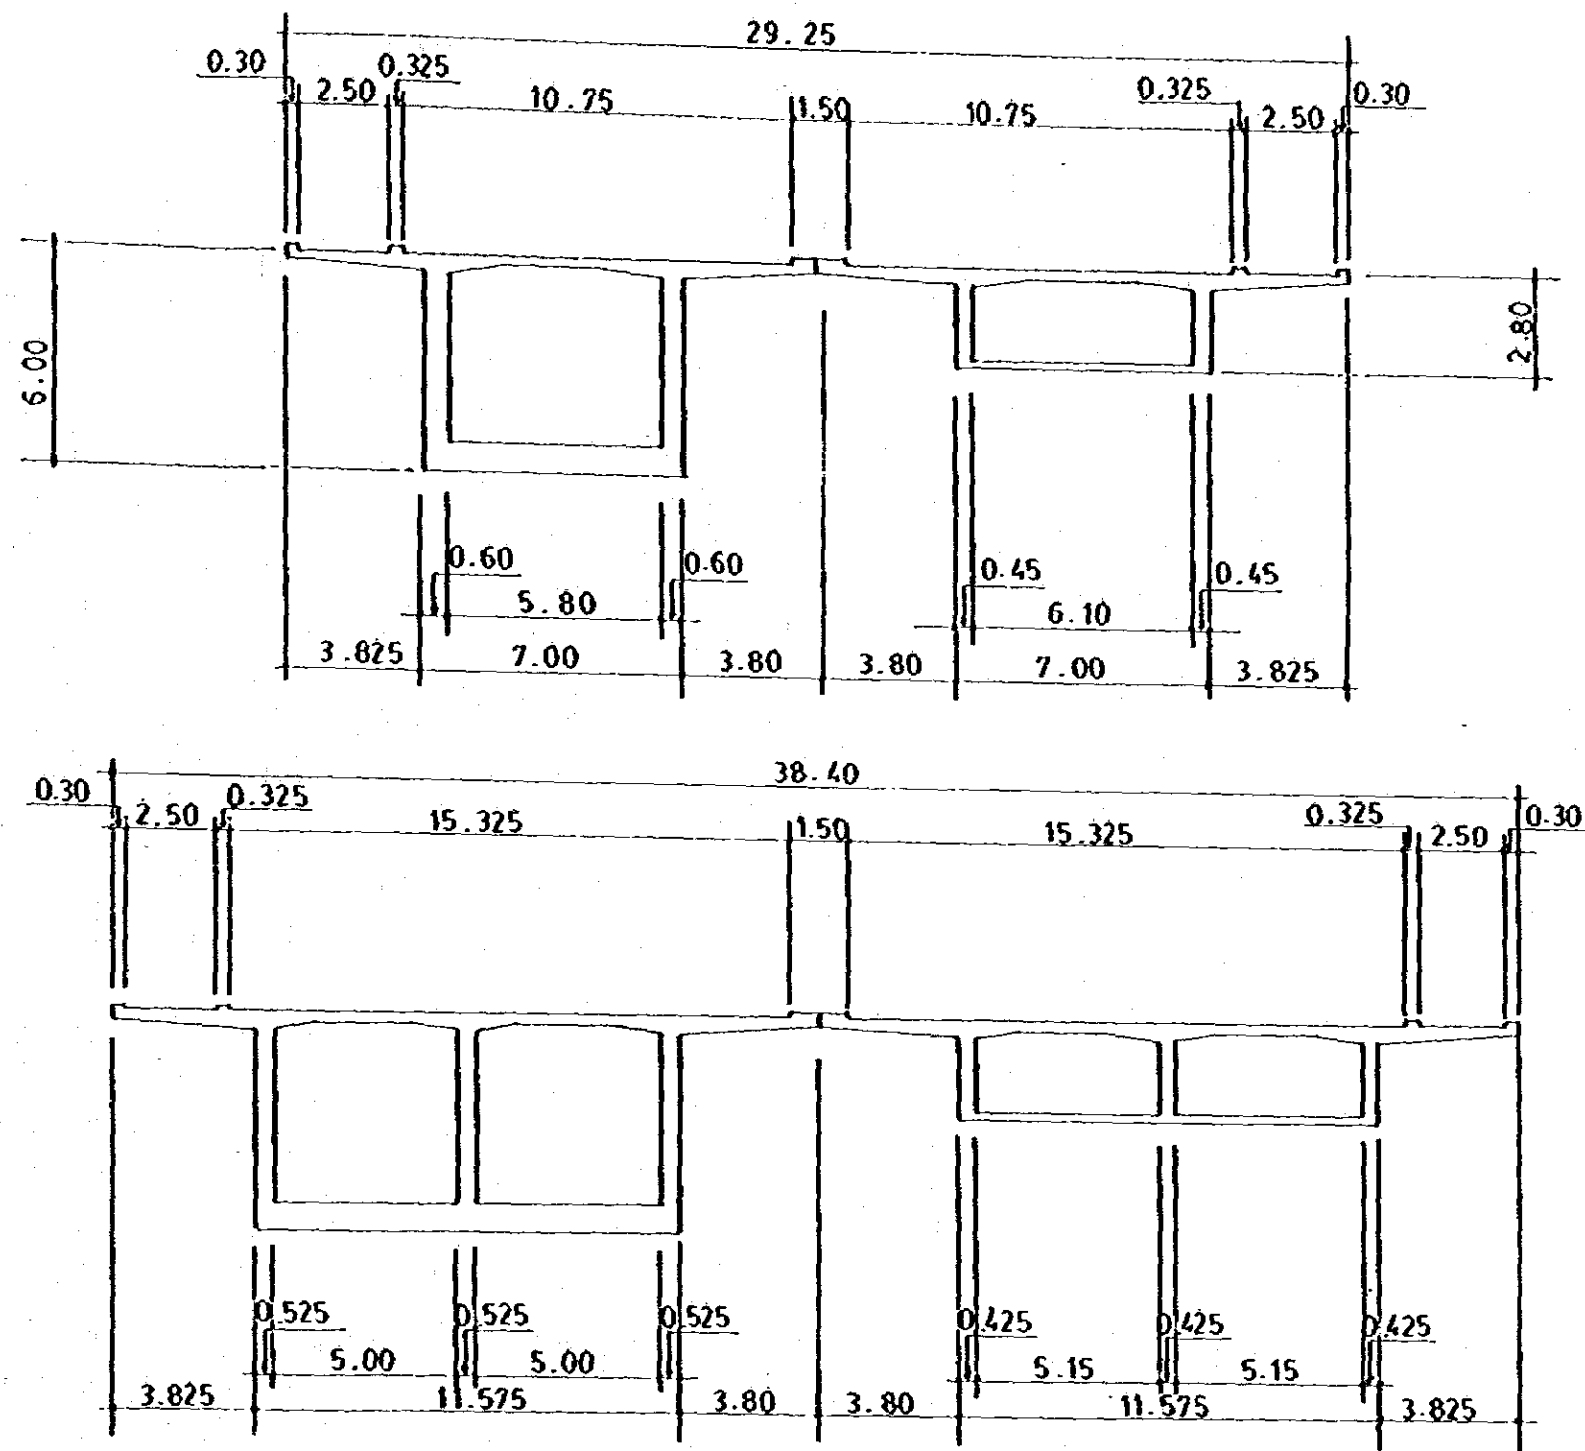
CROSS SECTION OF BOX GIRDER BRIDGE
